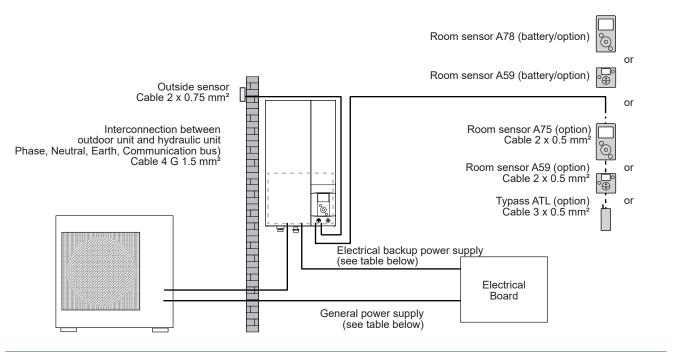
Overall layout of electrical connections for a simple installation (1 heating circuit)
